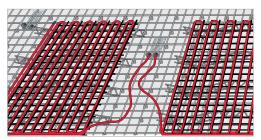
Step 2 - Assemble REHAU BKT S snakes
